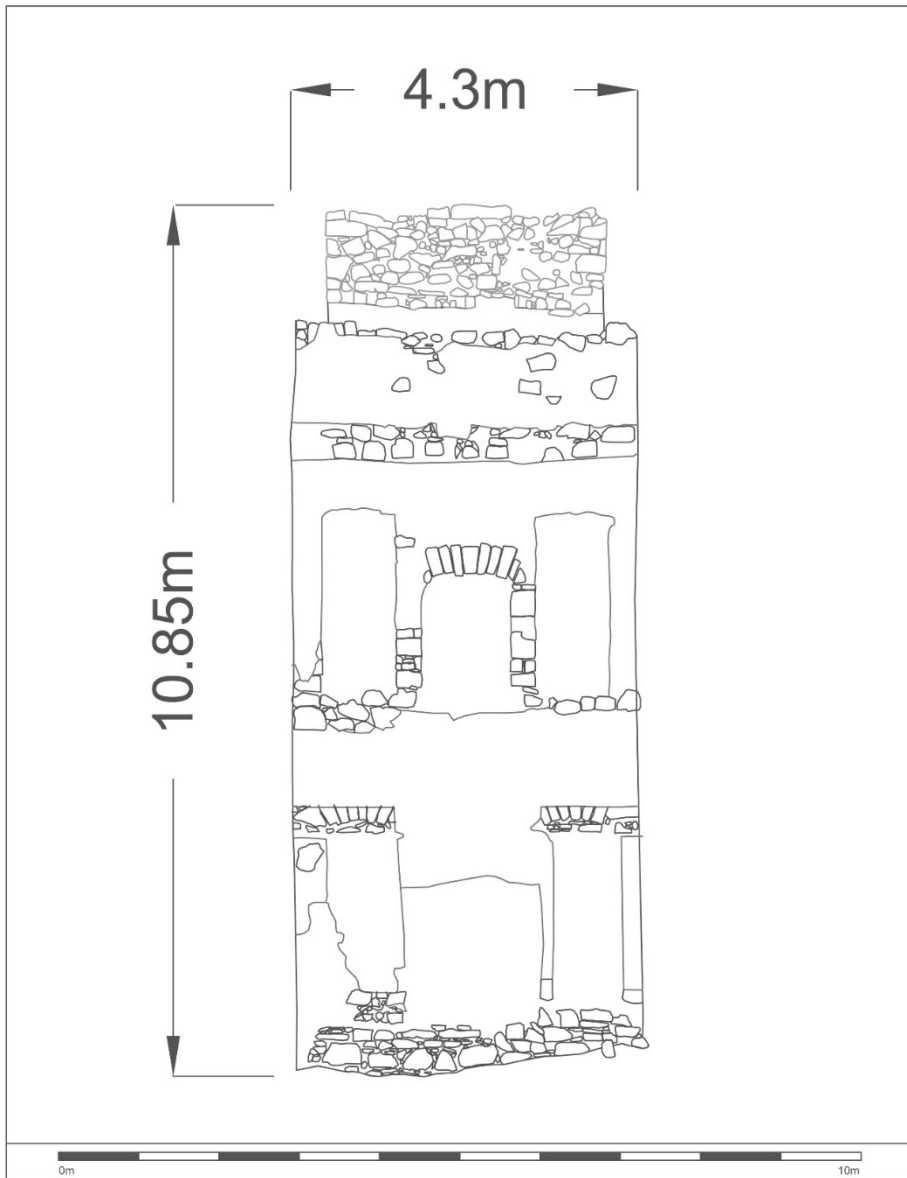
Internal elevation of the north-east wall of the signal tower at Golam Head Signal Station.
